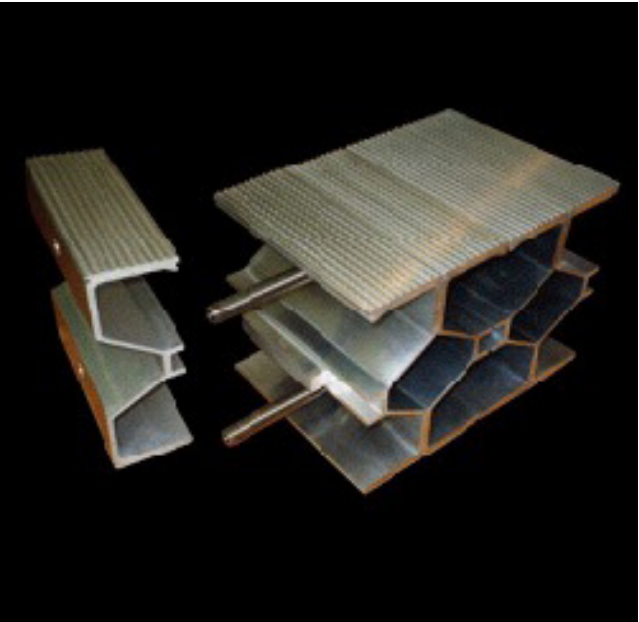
The structural aluminium deck of Lockmeadow Bridge is assembled from E-like aluminium extrusions
